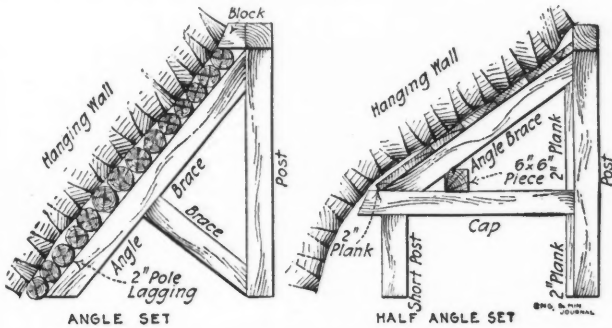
ANGLE SETS FOR SUPPORTING HANGING WALL
